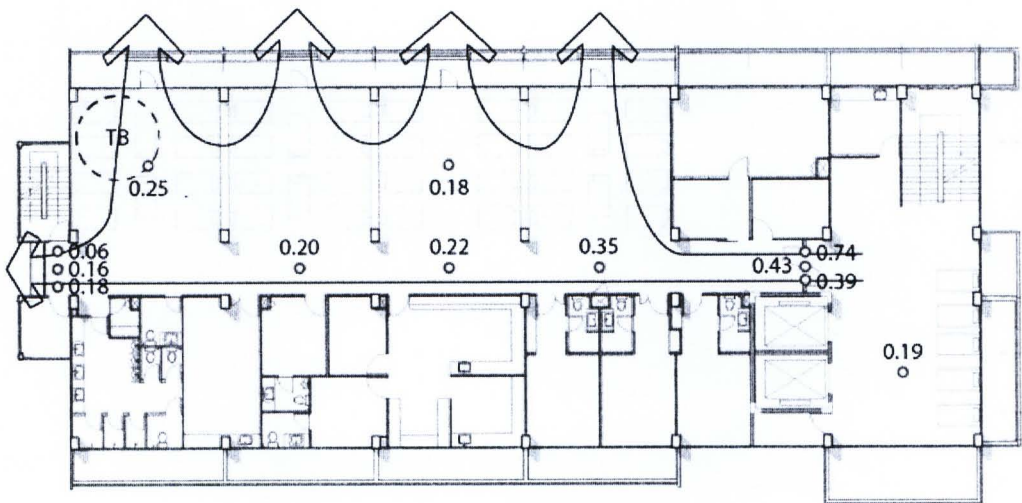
Floor plan and ventilation data of hospital B inpatient ward
